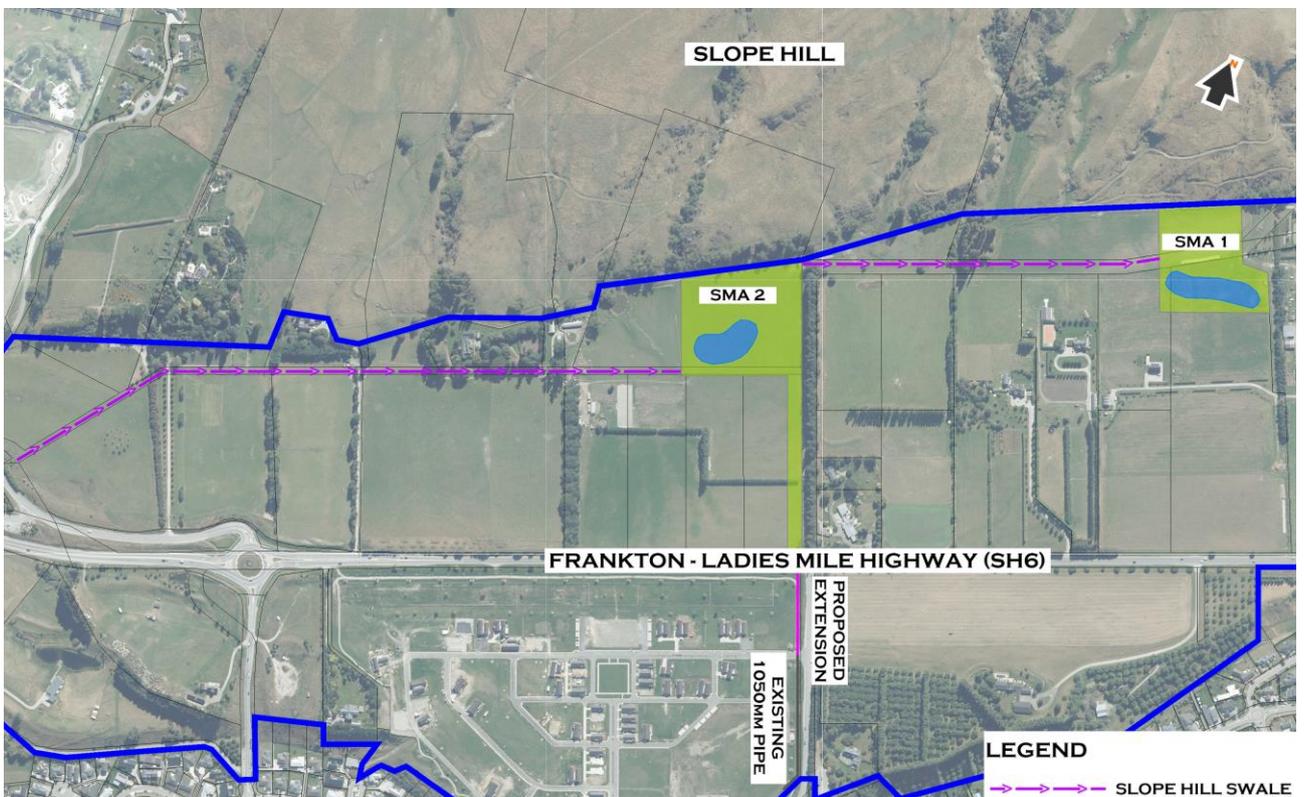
Central stormwater management area conceptual layout plan for North 2.
